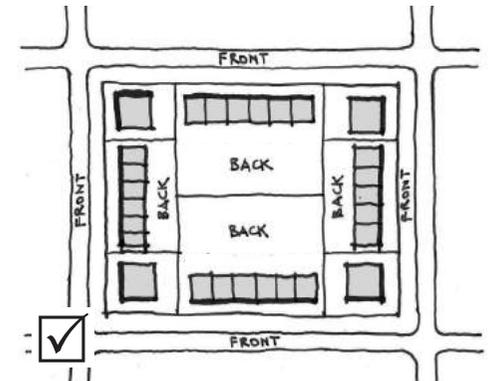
G: Perimeter block layout ensuring a clear definition of front and backs and a strong building line to the street
